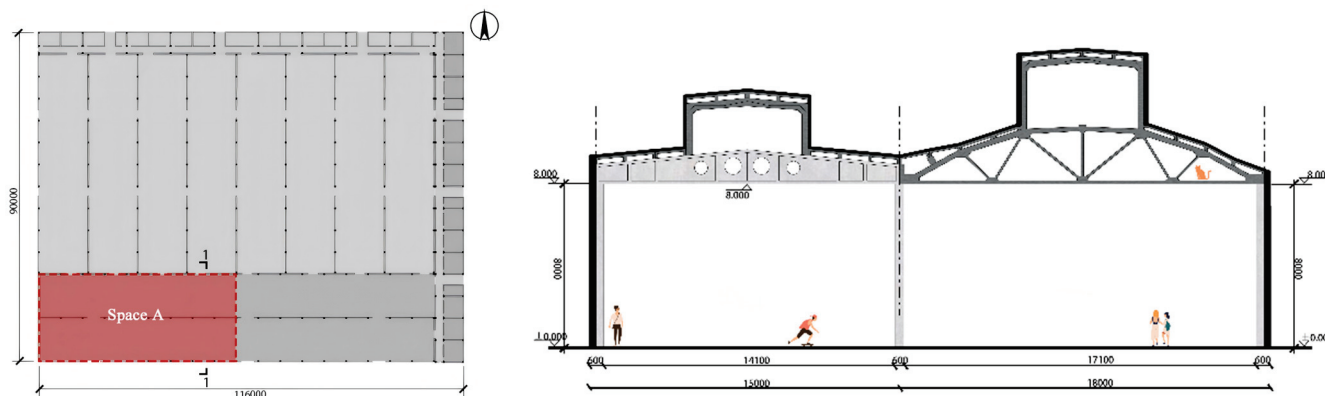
The redraw of floor plan and 1-1 section of Factory No. 2.
